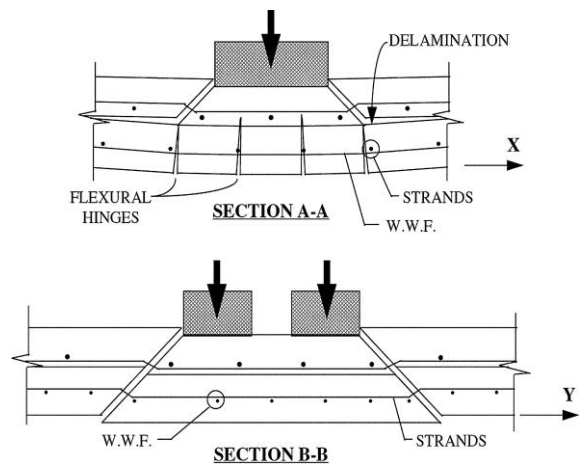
Schematic section view of combined failure mode for precast specimens [12]
